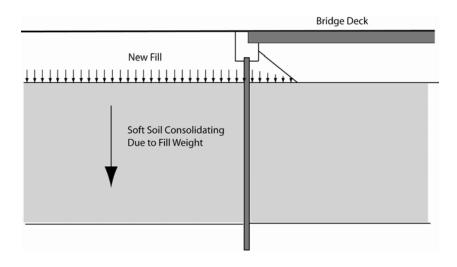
Consolidation of Foundation Soil Due to Fill Weight
